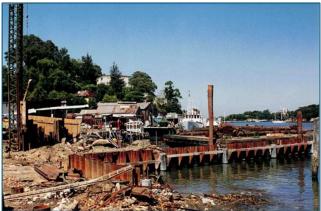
View to north-east showing excavated rock wall and laying of concrete slab for large, open, work sheds
